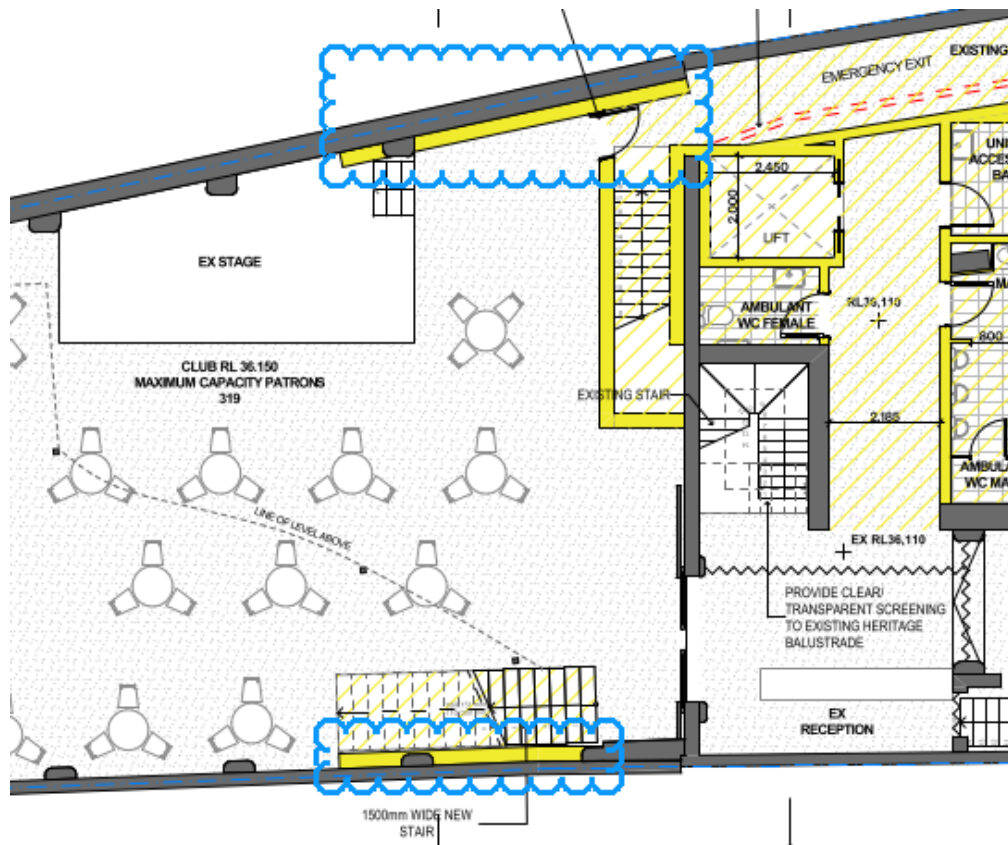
Original ground floor plan with proposed blade walls identified by blue clouding
